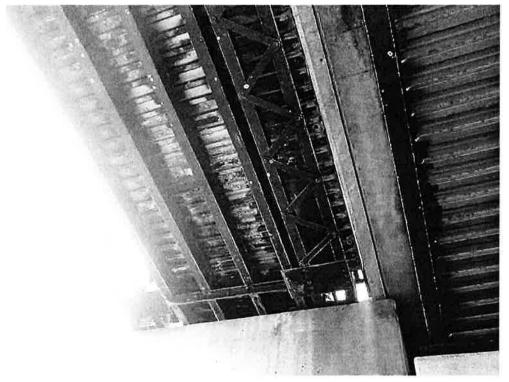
SIP forms, underside of south sidewalk, span 2, panel 1 (between floorbeams 1 and 2), near the southwest pier, looking west - moderate to heavy corrosion.
